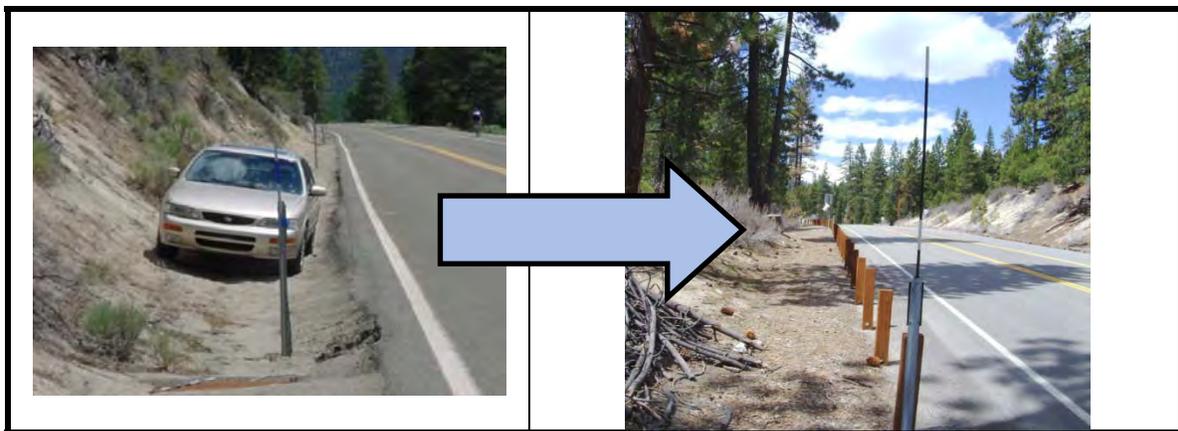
Slope stabilization. Riprap will be constructed on steep slopes and curb is placed along the toe of the slope to prevent undermining of the riprap and erosion of the shoulder. Retaining walls will be constructed in steep areas adjacent to the roadway to flatten the slope. The flatter slopes reduce runoff velocity and allow for flat areas of ponding and infiltration.
